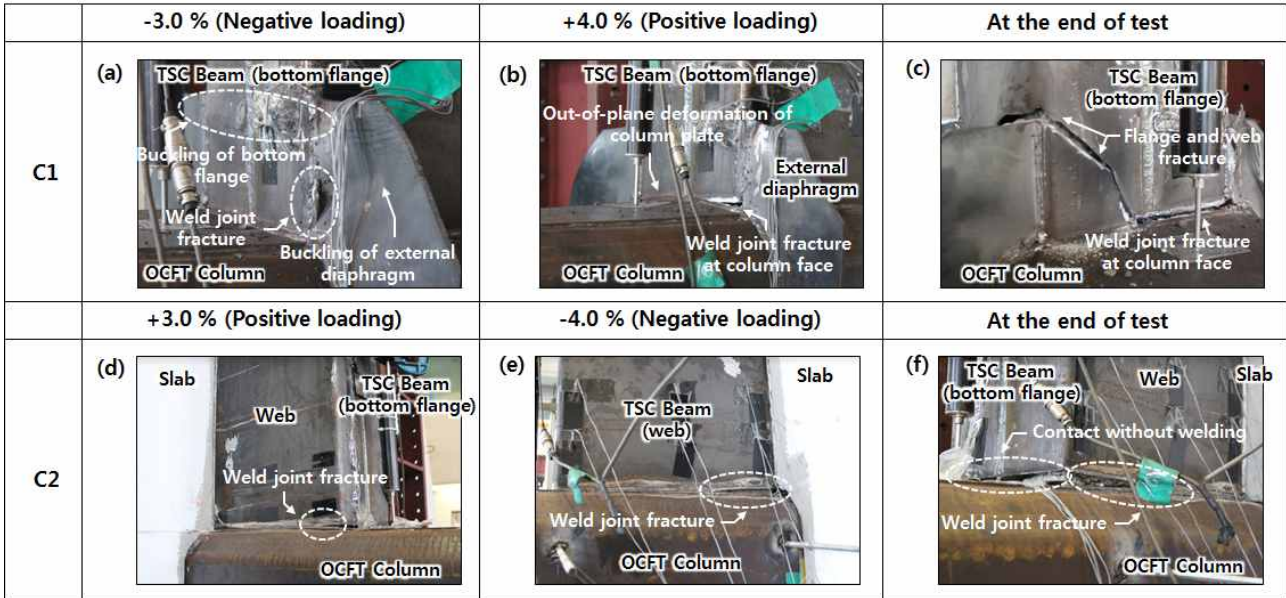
Failure modes at beam-to-column moment connection
